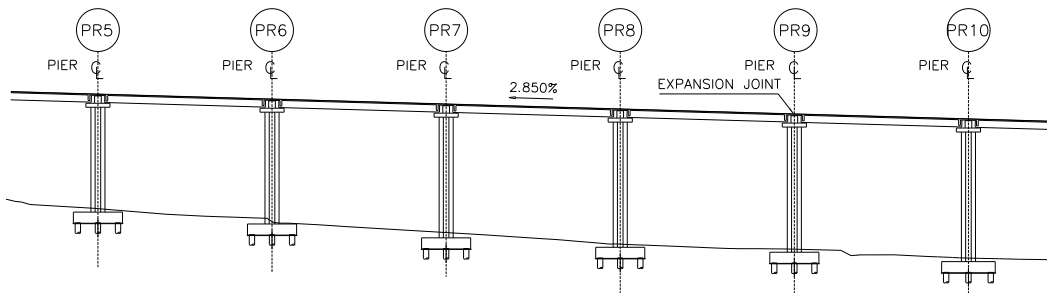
Profile View of the Bridge between Pier-5 and Pier-10
